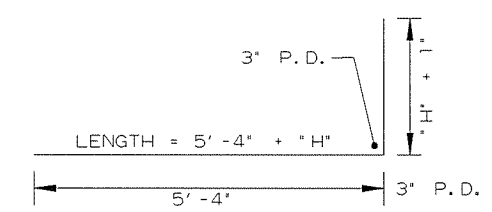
DETAIL OF REINFORCING STEEL FOR PAVEMENT (MESH FABRIC TYPE 3)
